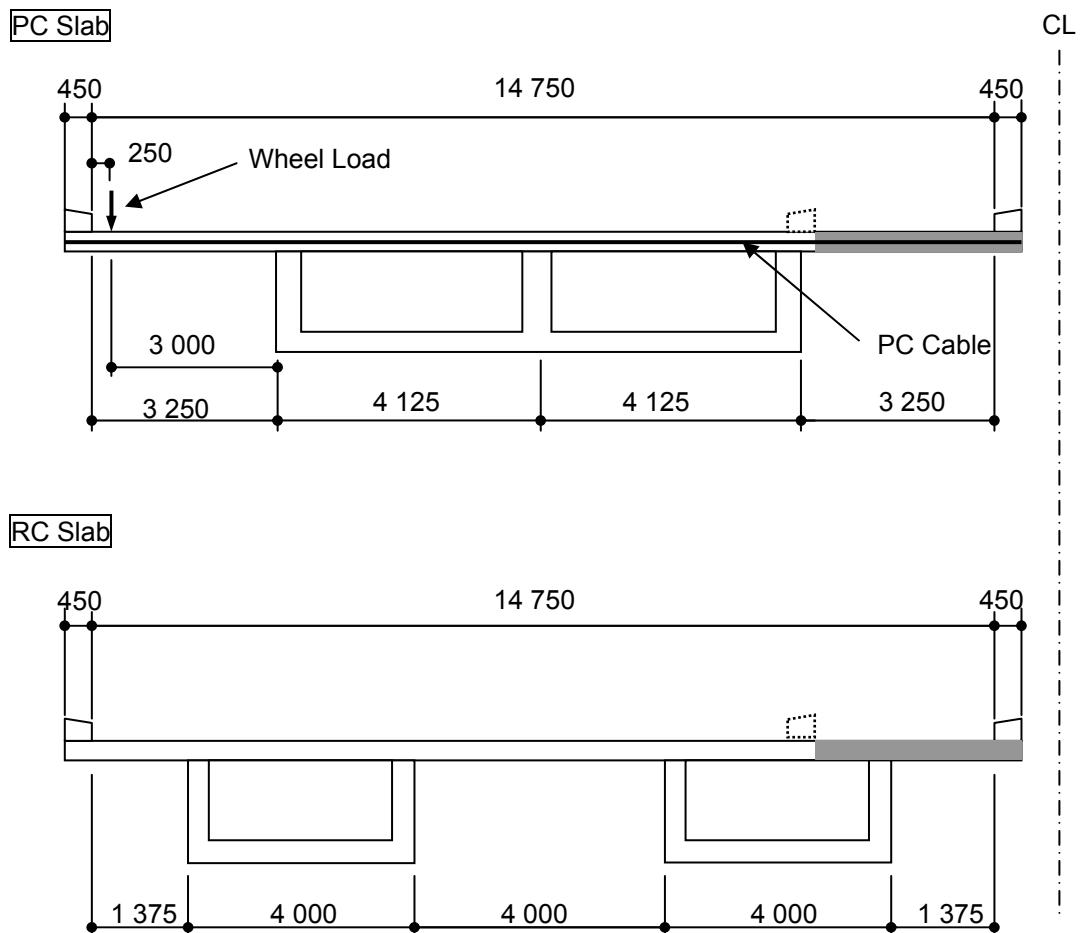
Road Width Widening of PC-Box Girder
